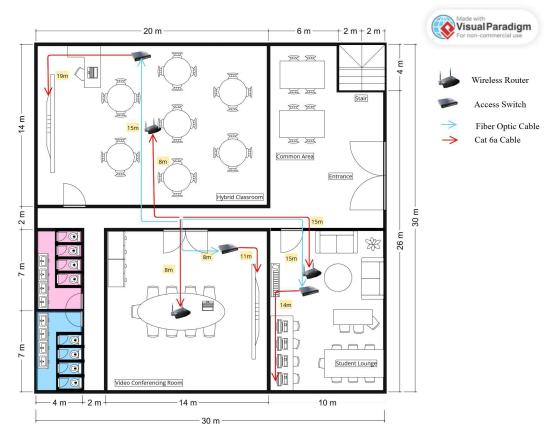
Network Device Arrangement in Ground Floor Plan
